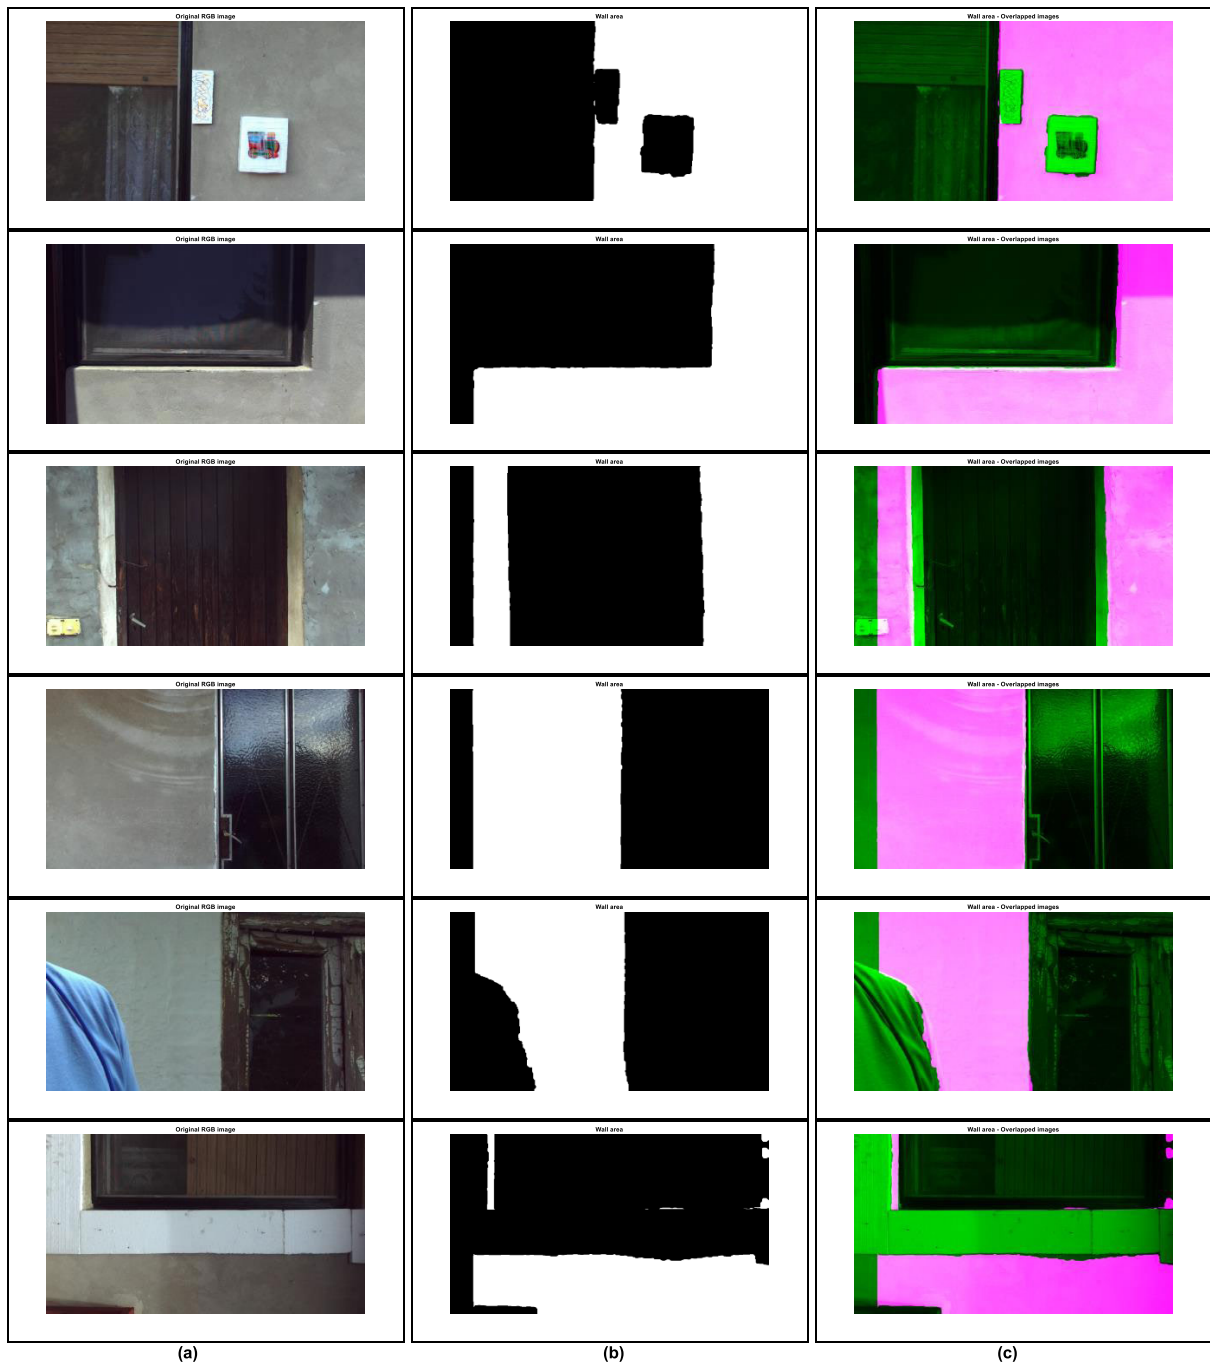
Testing examples: (a) original RGB image; (b) extracted wall area intended for painting; (c) overlapped RGB image with the extracted wall area.
